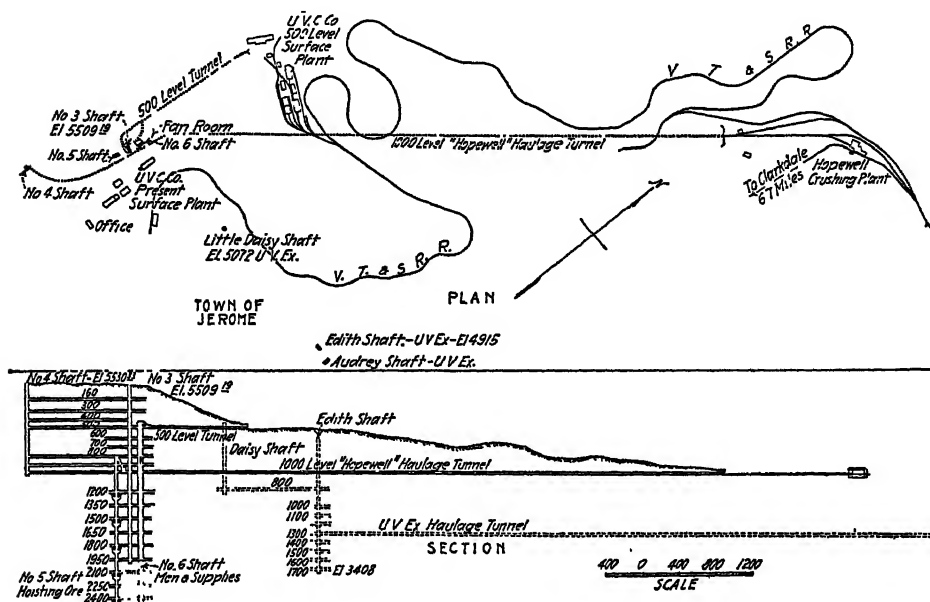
LOCATION OF SHAFTS AND TUNNELS, UNITED VERDE MINE.
